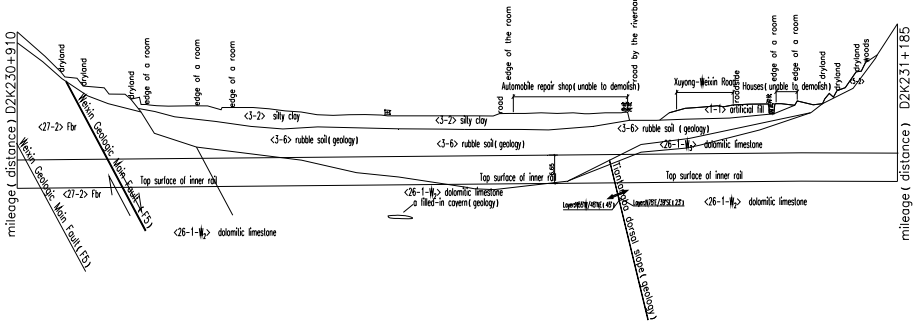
Longitudinal section of the shallow-buried section of the tunnel
